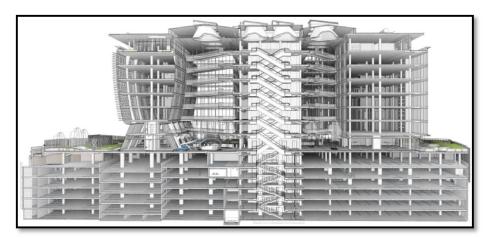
Cross Section of Alexander Forbes (www.paragon.co.za)
